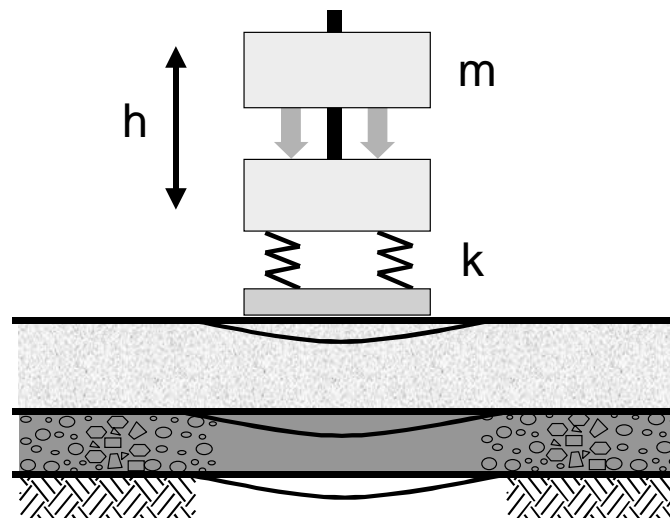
Schematic (elevation) view of the impulse type FWD test equipment (16).
